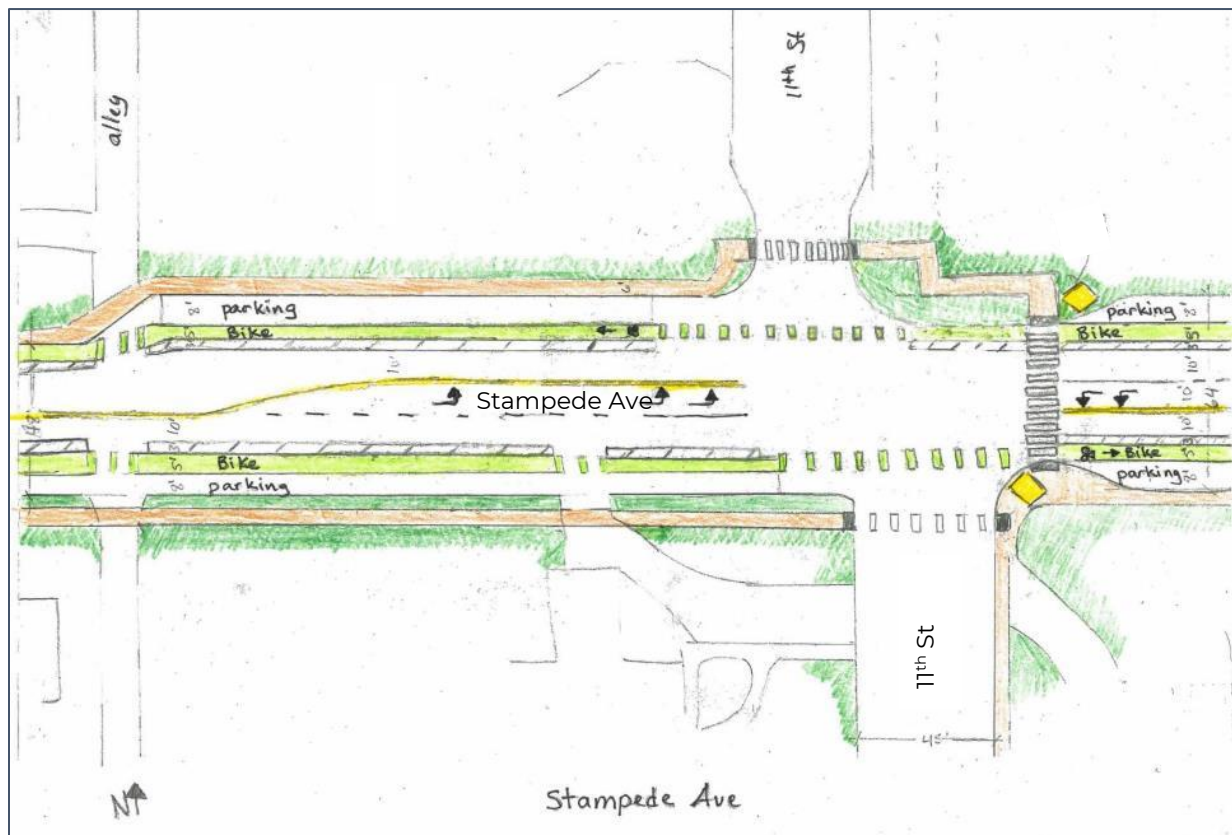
Concept for Stampede Avenue and Intersection with 11th Street
